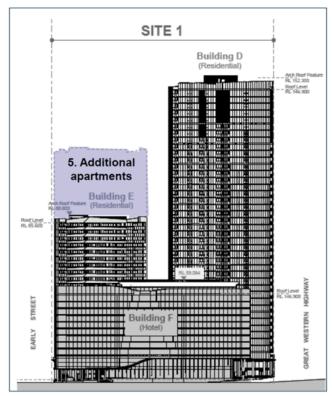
Proposed additional 10 storeys on Building E, Site 1
